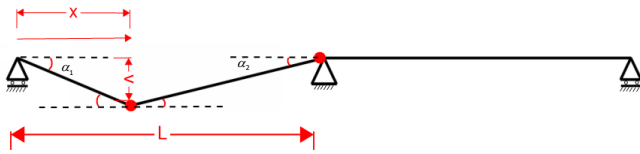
Limit Analysis Collapse Mechanism of Bridge
